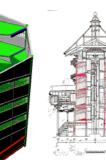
Exterior Figure 7b: Model of Figure 7c: Full tower with walls added - wire frame walls - colorized
